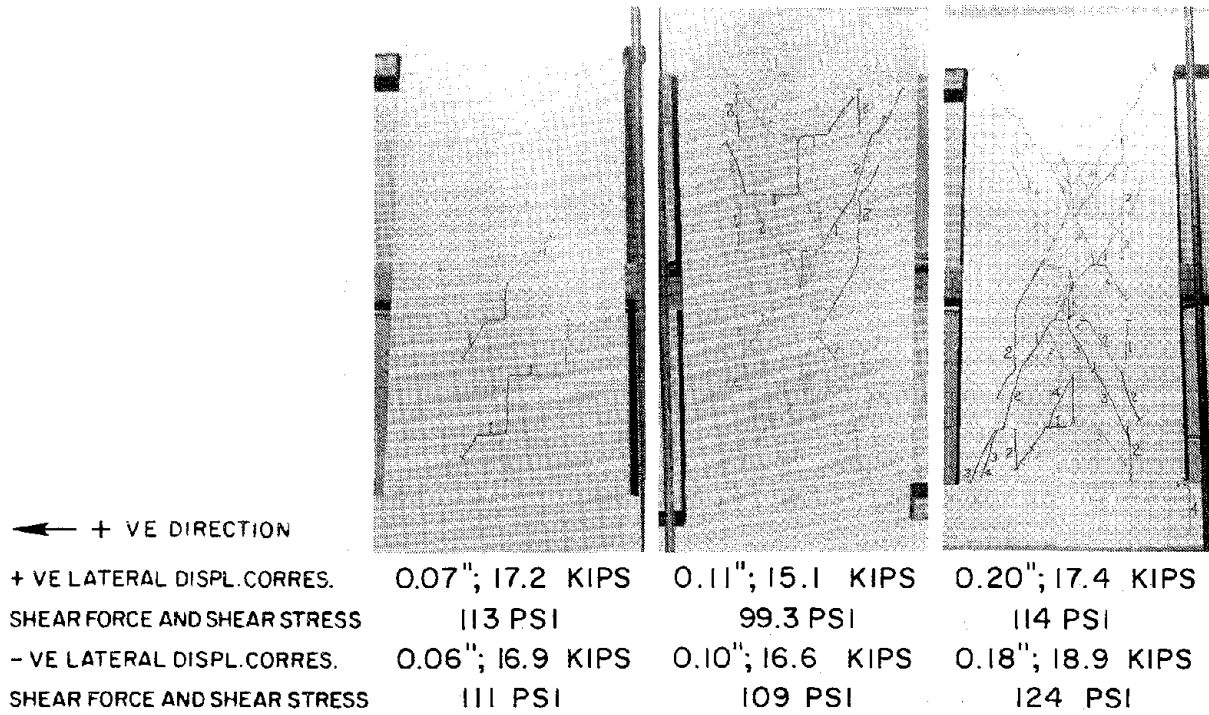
SUCCESSIVE CRACK FORMATION TEST 11. (RIGHT SIDE PIER)
